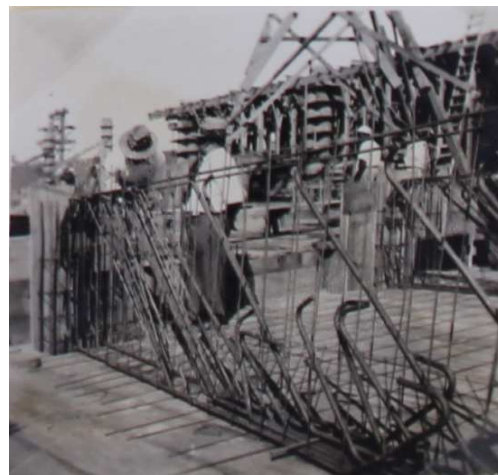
On the left, the structure of the building under construction and above a reinforcement cage of a beam. Photographs taken in 1939
